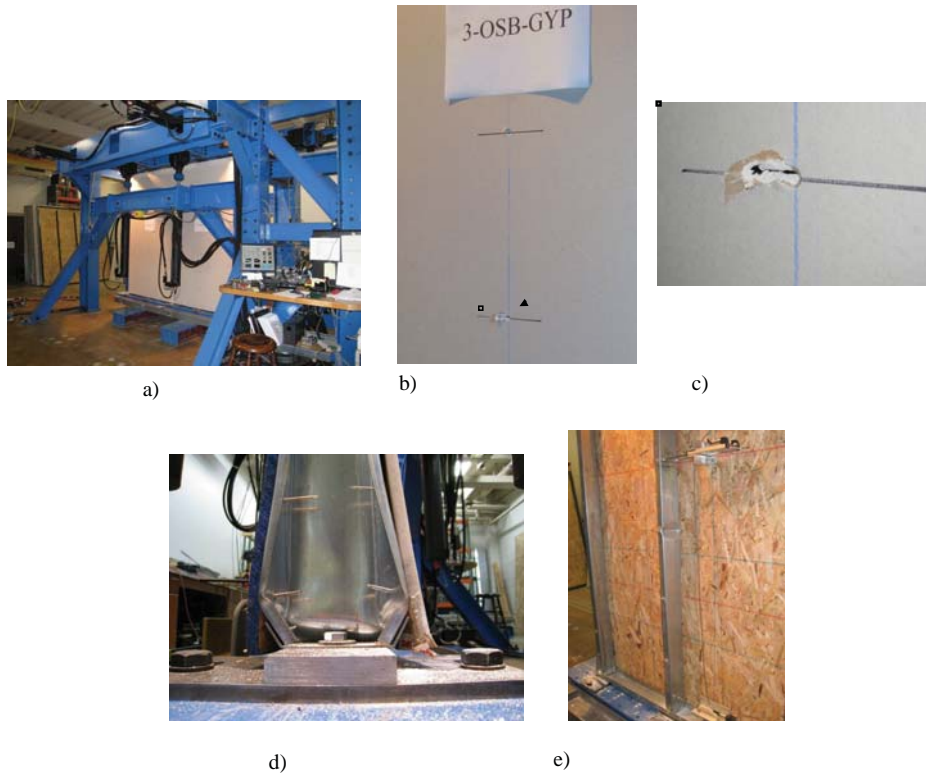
Response of specimen 3-OSB-Gyp: (a) side view; (b) bearing failure / screw tearing out board; (c) close-up view of bearing failure; (d) local buckling; (e) wall opened after test.
